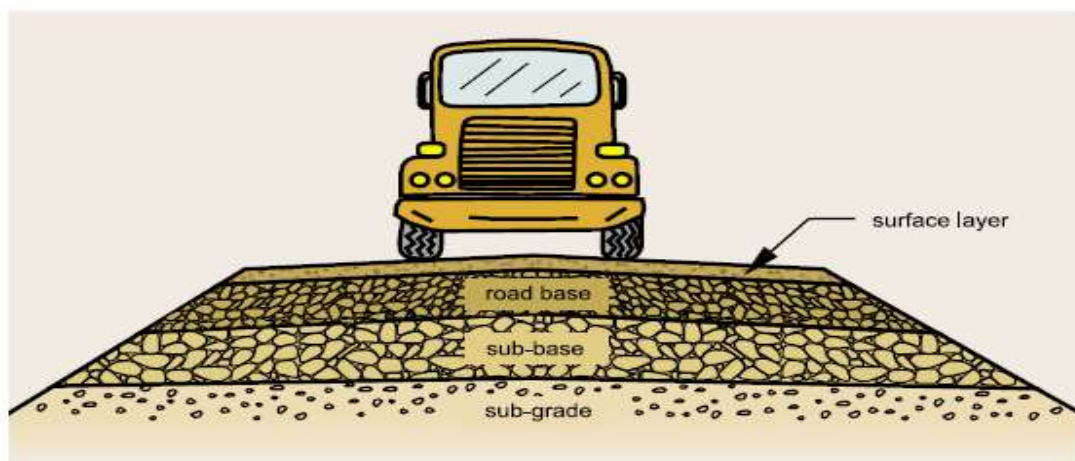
Asphalt Pavement layers (Suryakanta, 2019)
